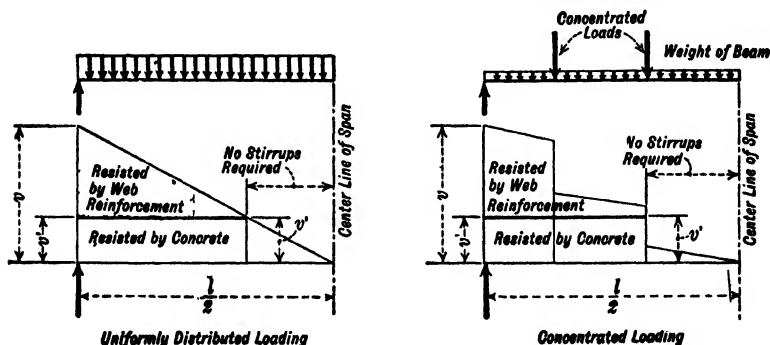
First Method. Distribution of Diagonal Tension between Concrete and Web Reinforcement. (See p. 246.)
